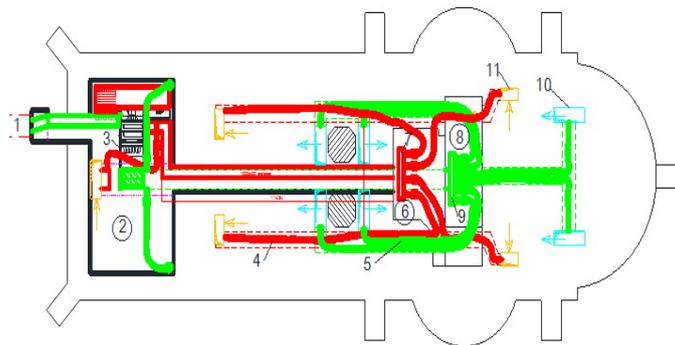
Networks existing air channels under the floor: 1-fresh air intake channel; 2-basement of porch; 3- air handling unit; 4-flexible pipe connected to the suction grid; 5- flexible pipe connected to the outlet grid; 6- suction chamber; 7- exhaust air collector; 8- pressure side chamber; 9- treated air collector; 10-outlet grid; 11-suction grid
